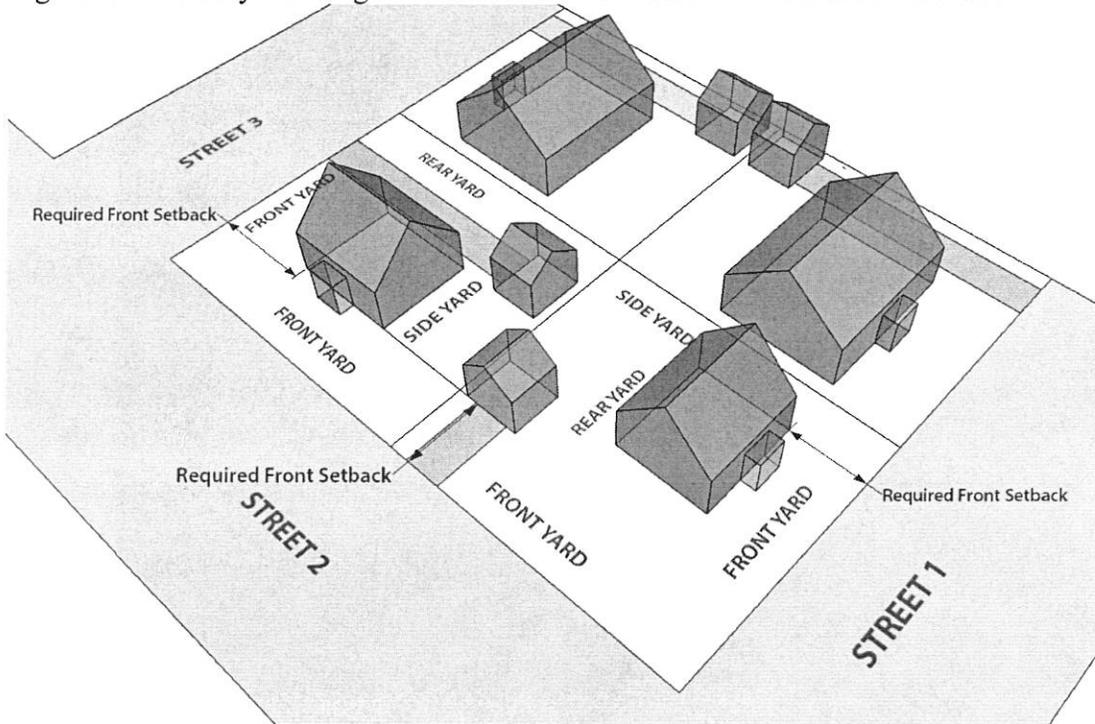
Accessory Building Location for Corner Lots with Side-Side Yard Situation
